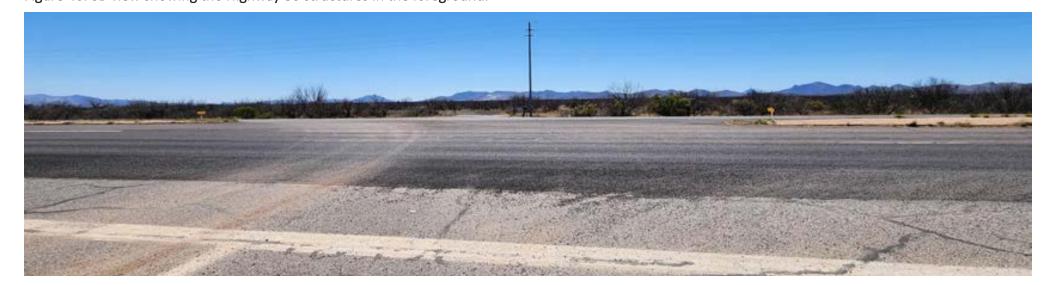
Southwest view showing the intersection of Hwy 80 and North Brooks Rd.
